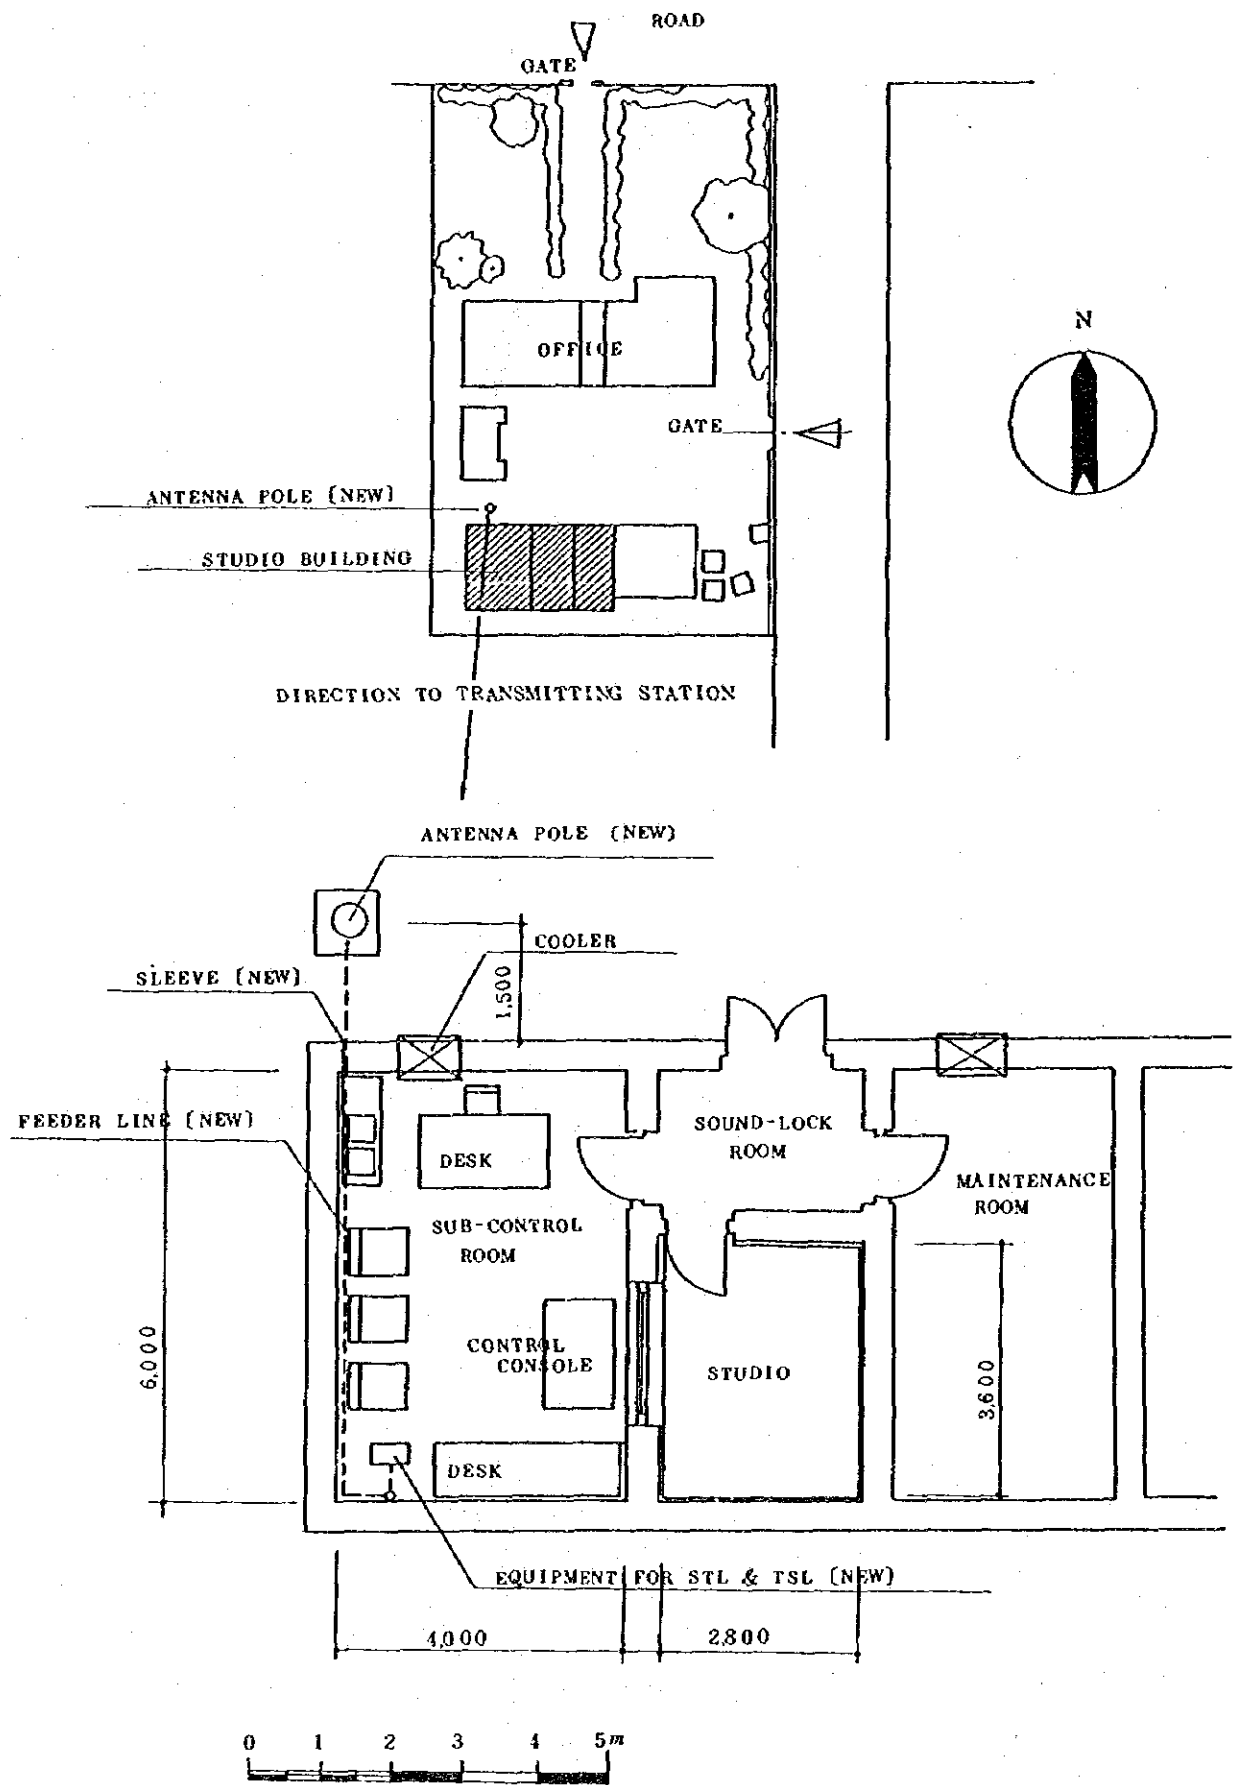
Layout of Equipment and Other Facilities (Atbara)
